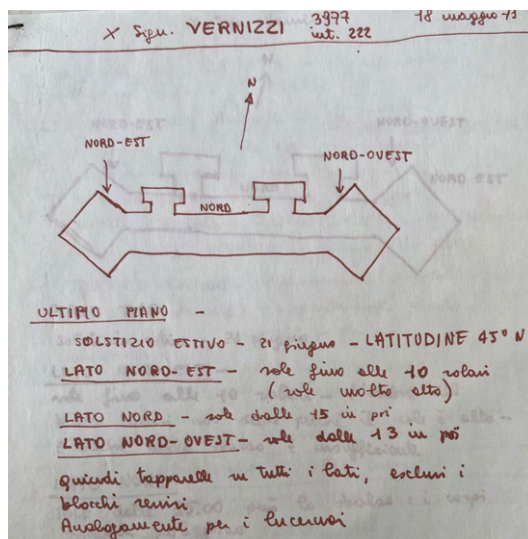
Alfa Romeo Office Building, Arese, 1968-74. Project notes. Gardella Historical Archive, CSAC.
